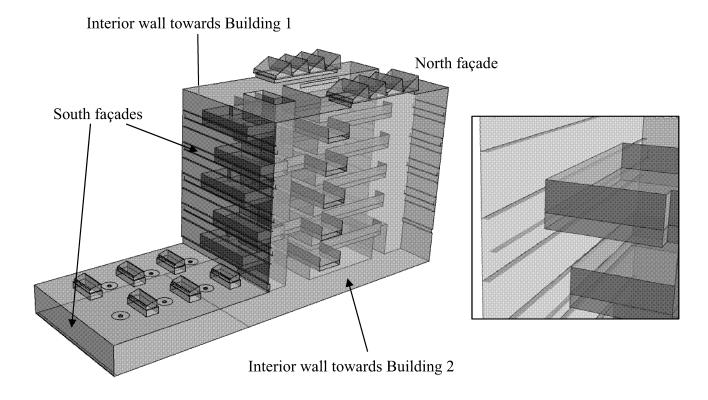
Geometrical model of atrium. Details of inside of façade with downdraft spoilers (right).
